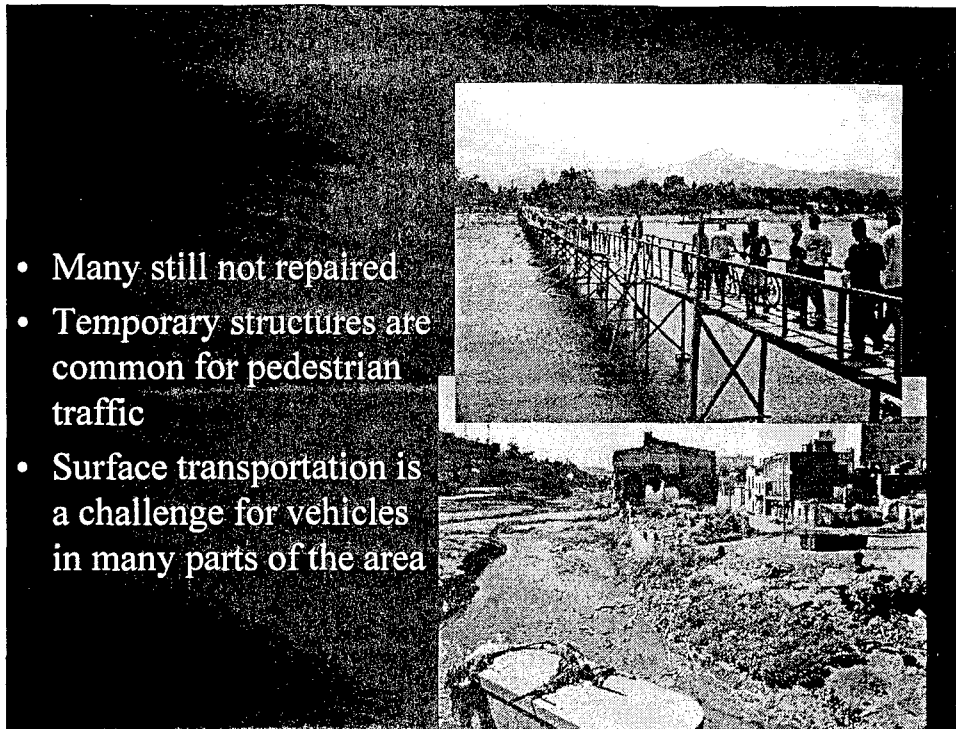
Temporary foot bridges and Damaged Bridge Infrastructure
